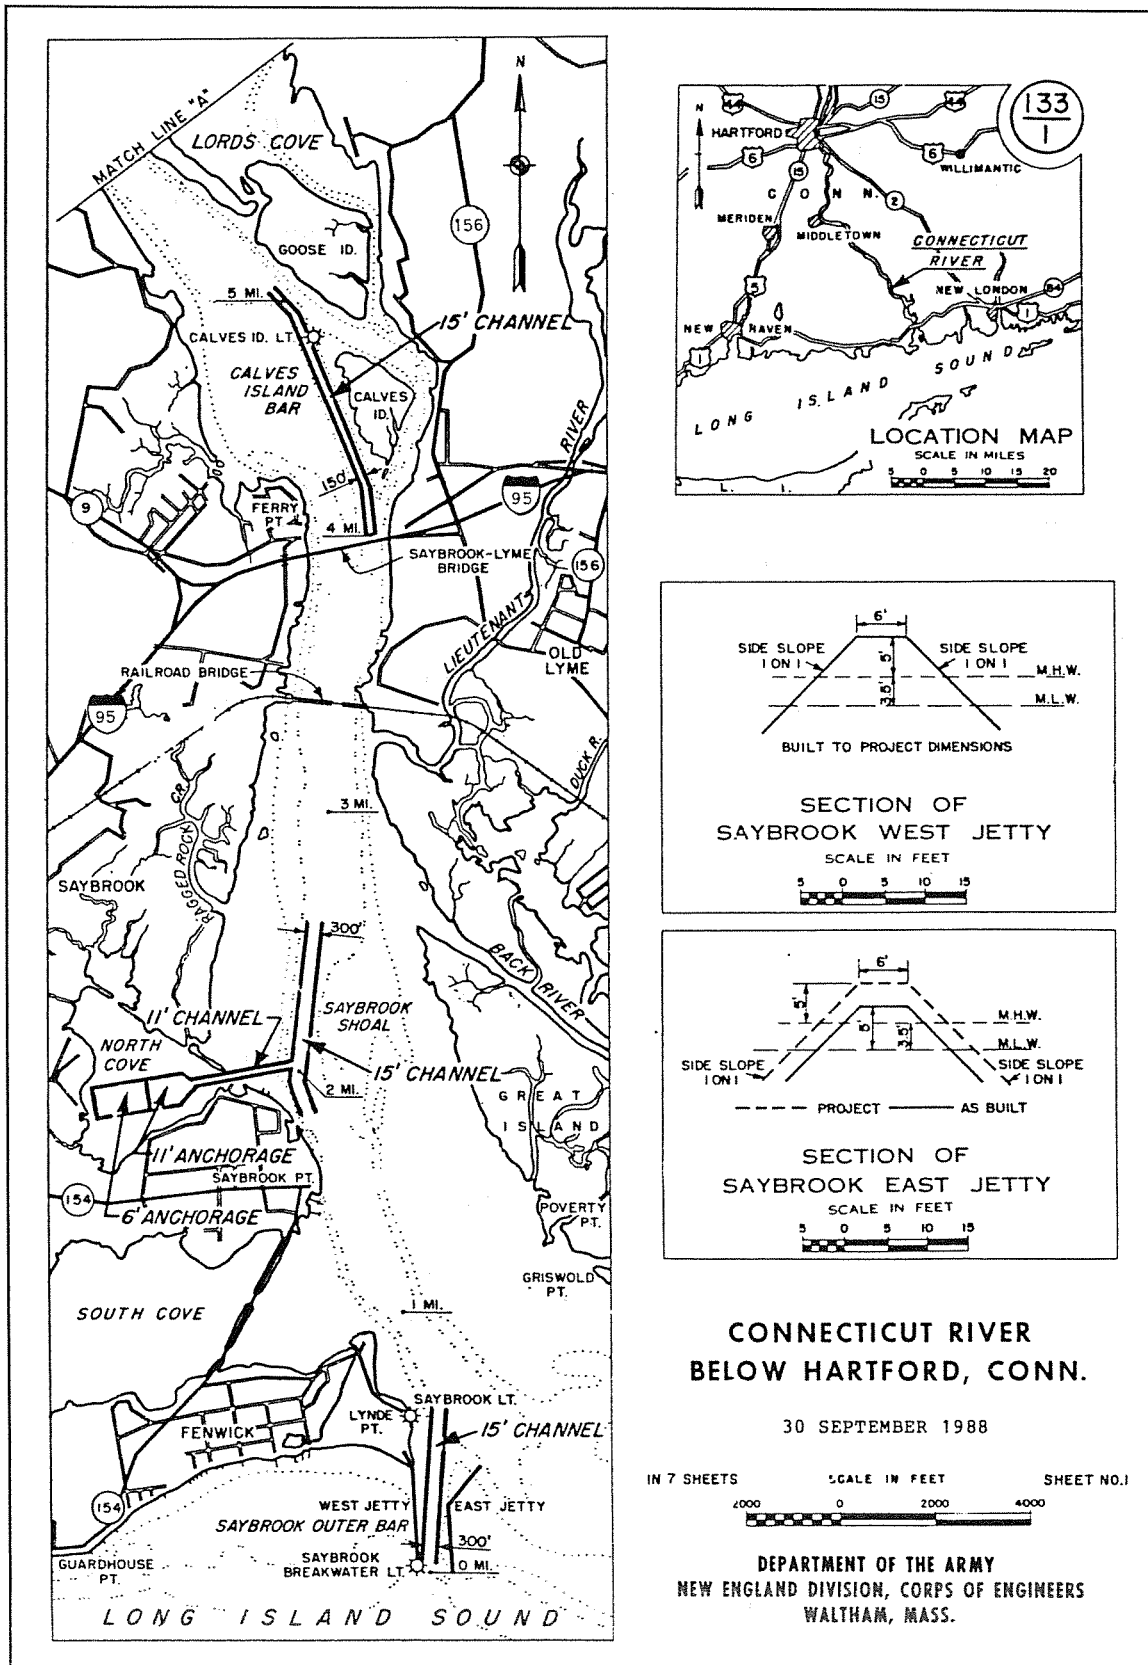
Connecticut River Federal Navigation Project at Old Saybrook. (Source: Corps of Engineers, "Navigation and Beach Erosion Control Projects, Volume 3 - Rhode Island and Connecticut," Sept. 30, 1988.)
